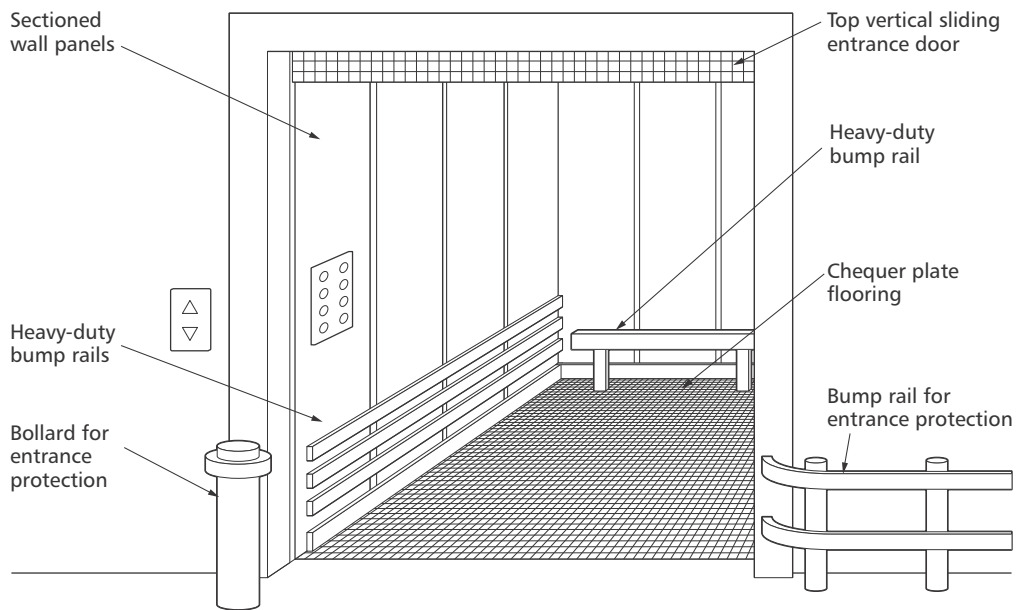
Entrances, car fittings and finishes for a rugged goods passenger lift
